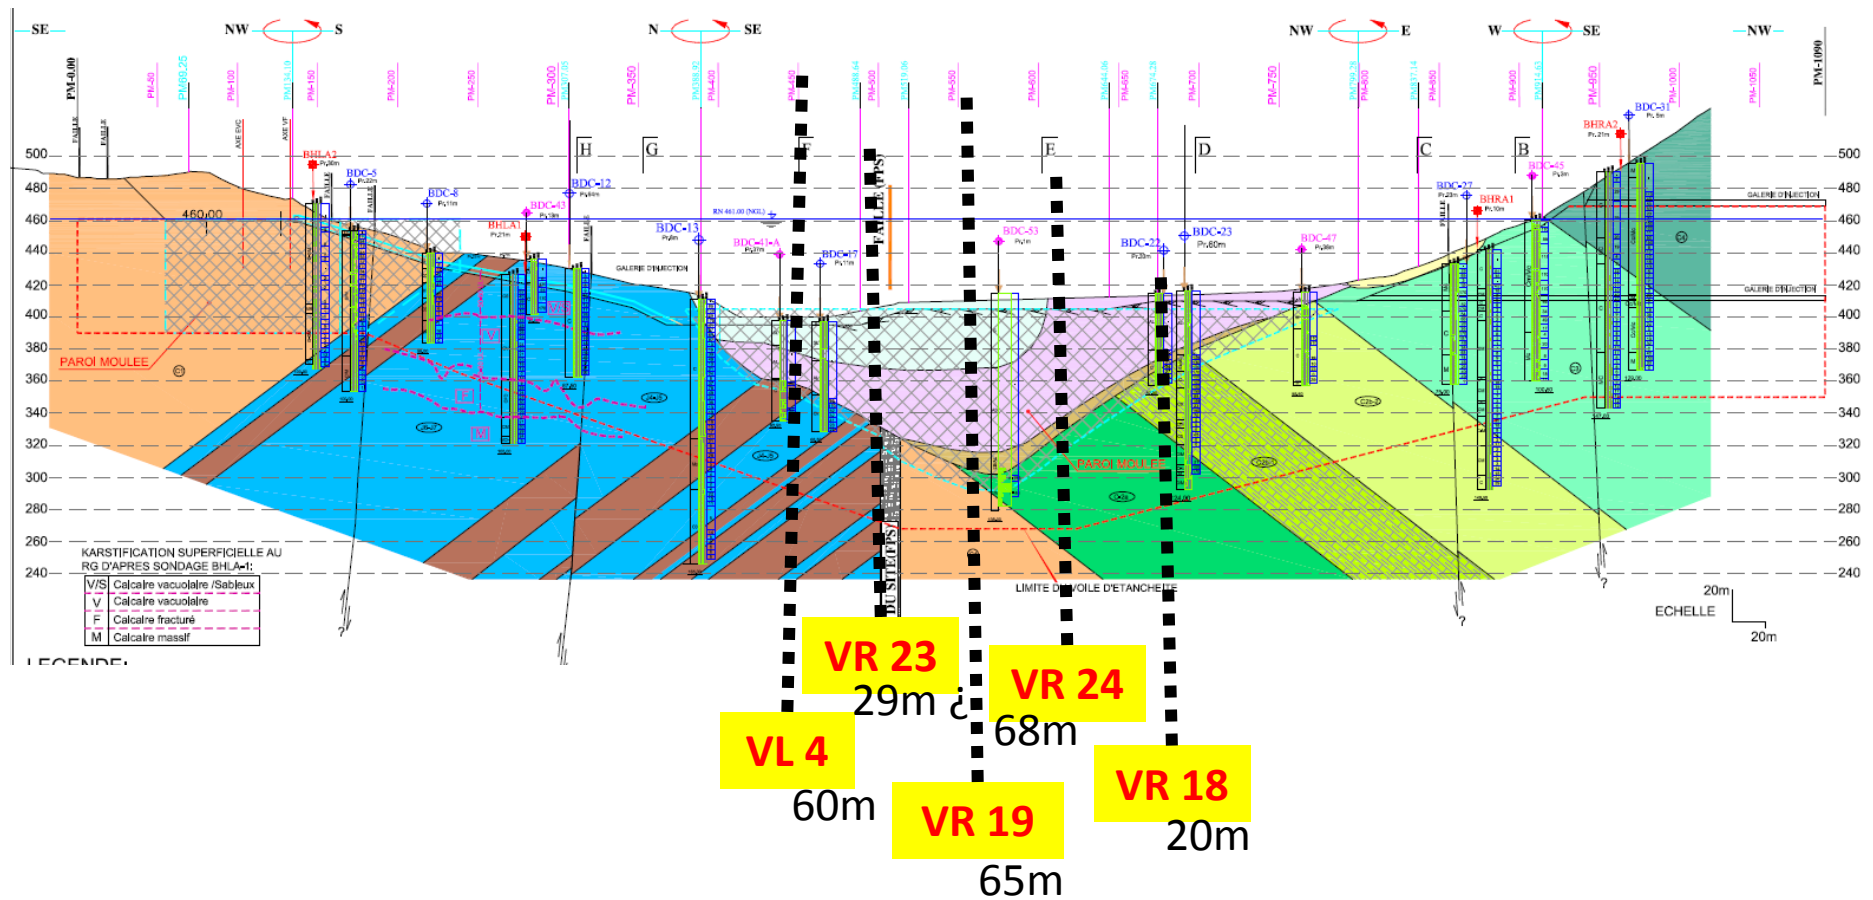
CPTu tests near longitudinal section C (cut-off wall)
